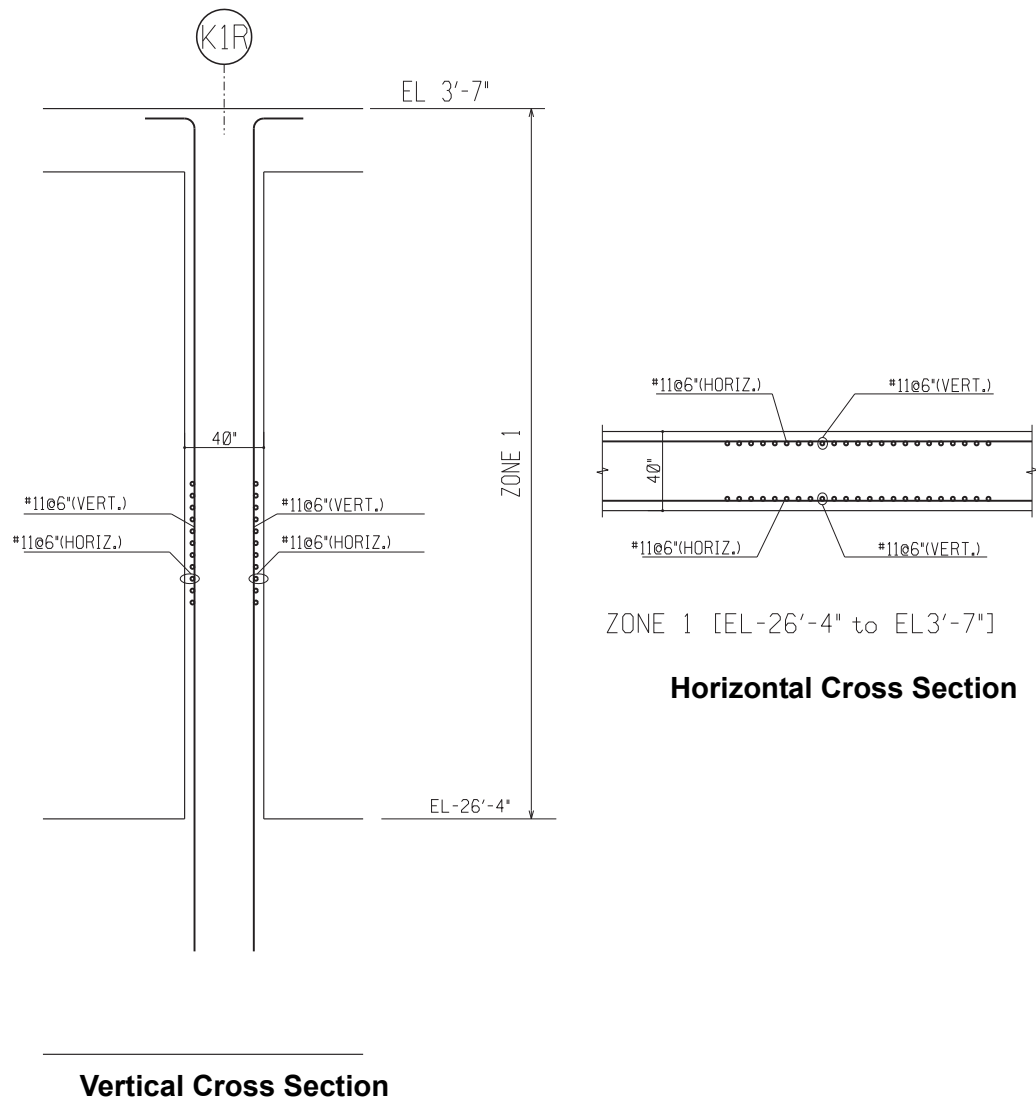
East PS/B Wall and Slab Critical Sections
